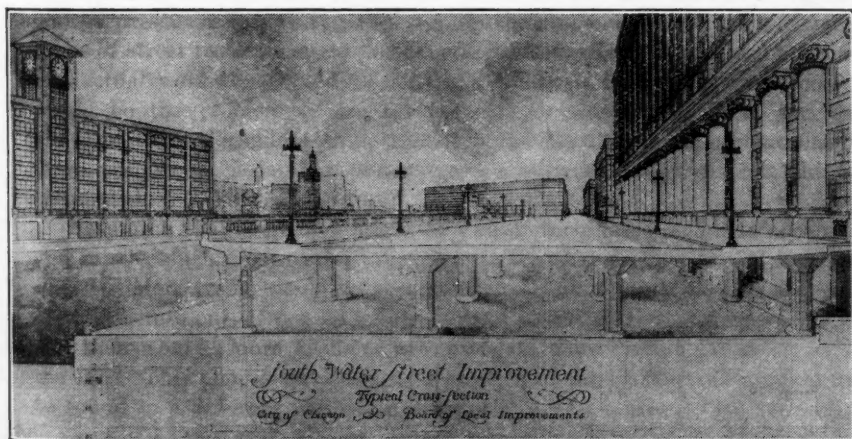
THE SOUTH WATER STREET IMPROVEMENT (PROPOSED) IN CROSS-SECTION,
